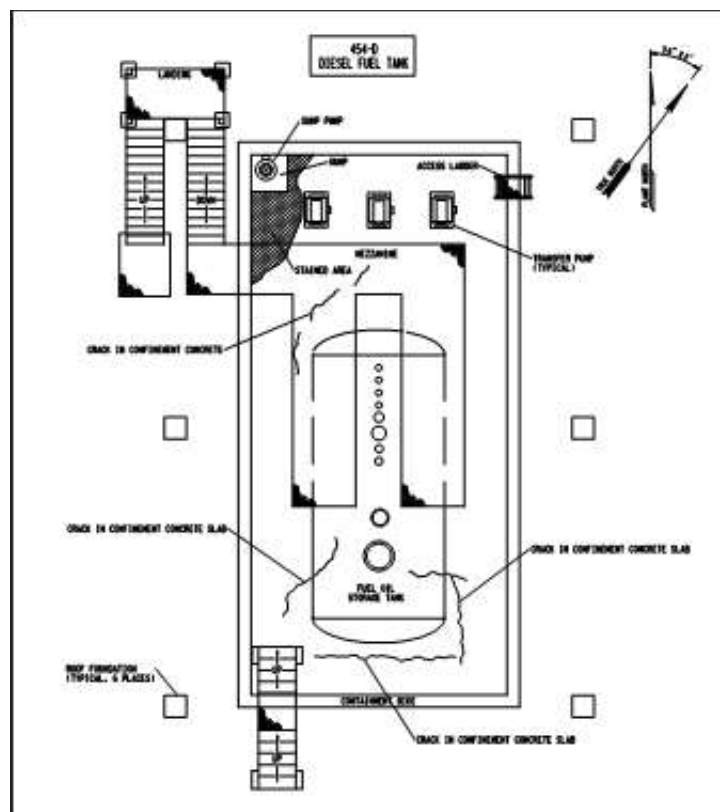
Building 454-D, D-Area Diesel Fuel Tank Layout (Plan View)
